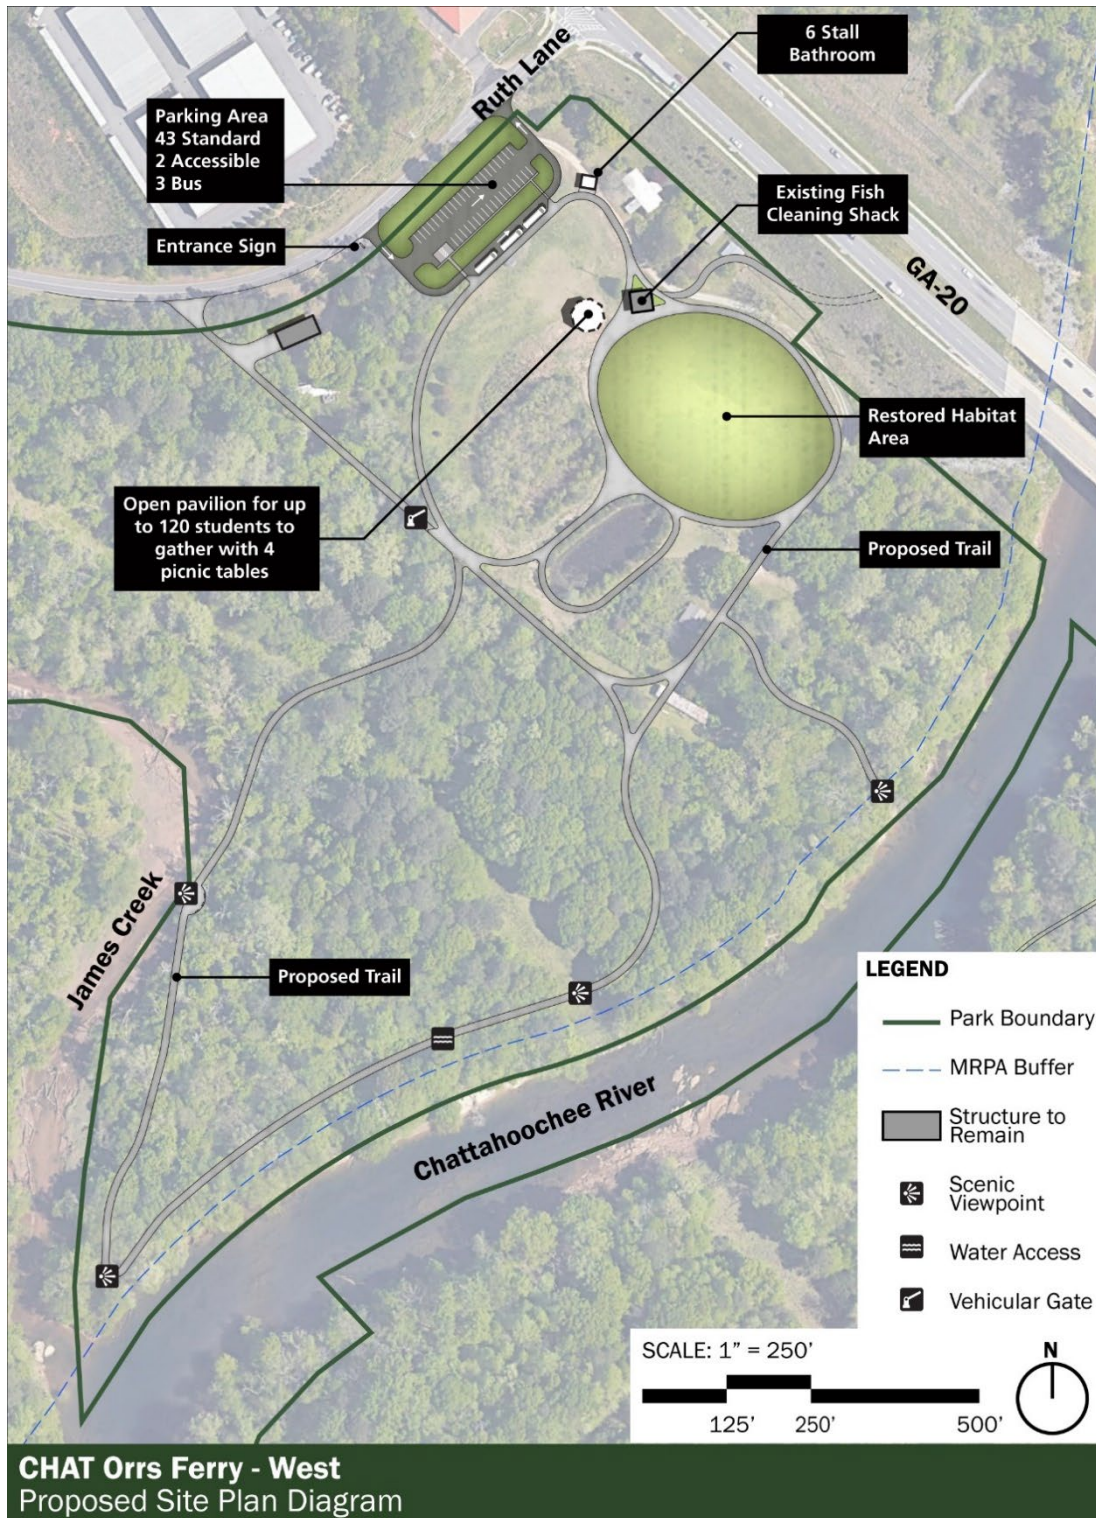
WEST SIDE ACTIONS SITE PLAN
